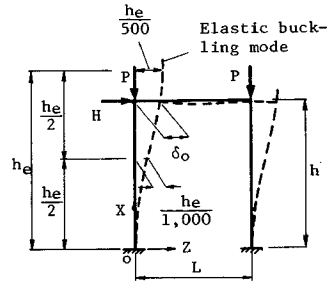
Dimension of steel frame and pattern of initial deflection.
